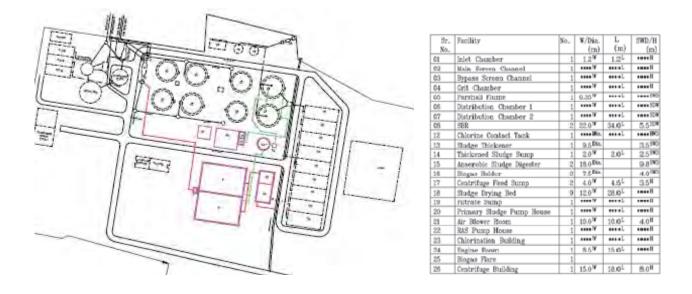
Layout plan of Bhagwanpur STP (SBR plan)
